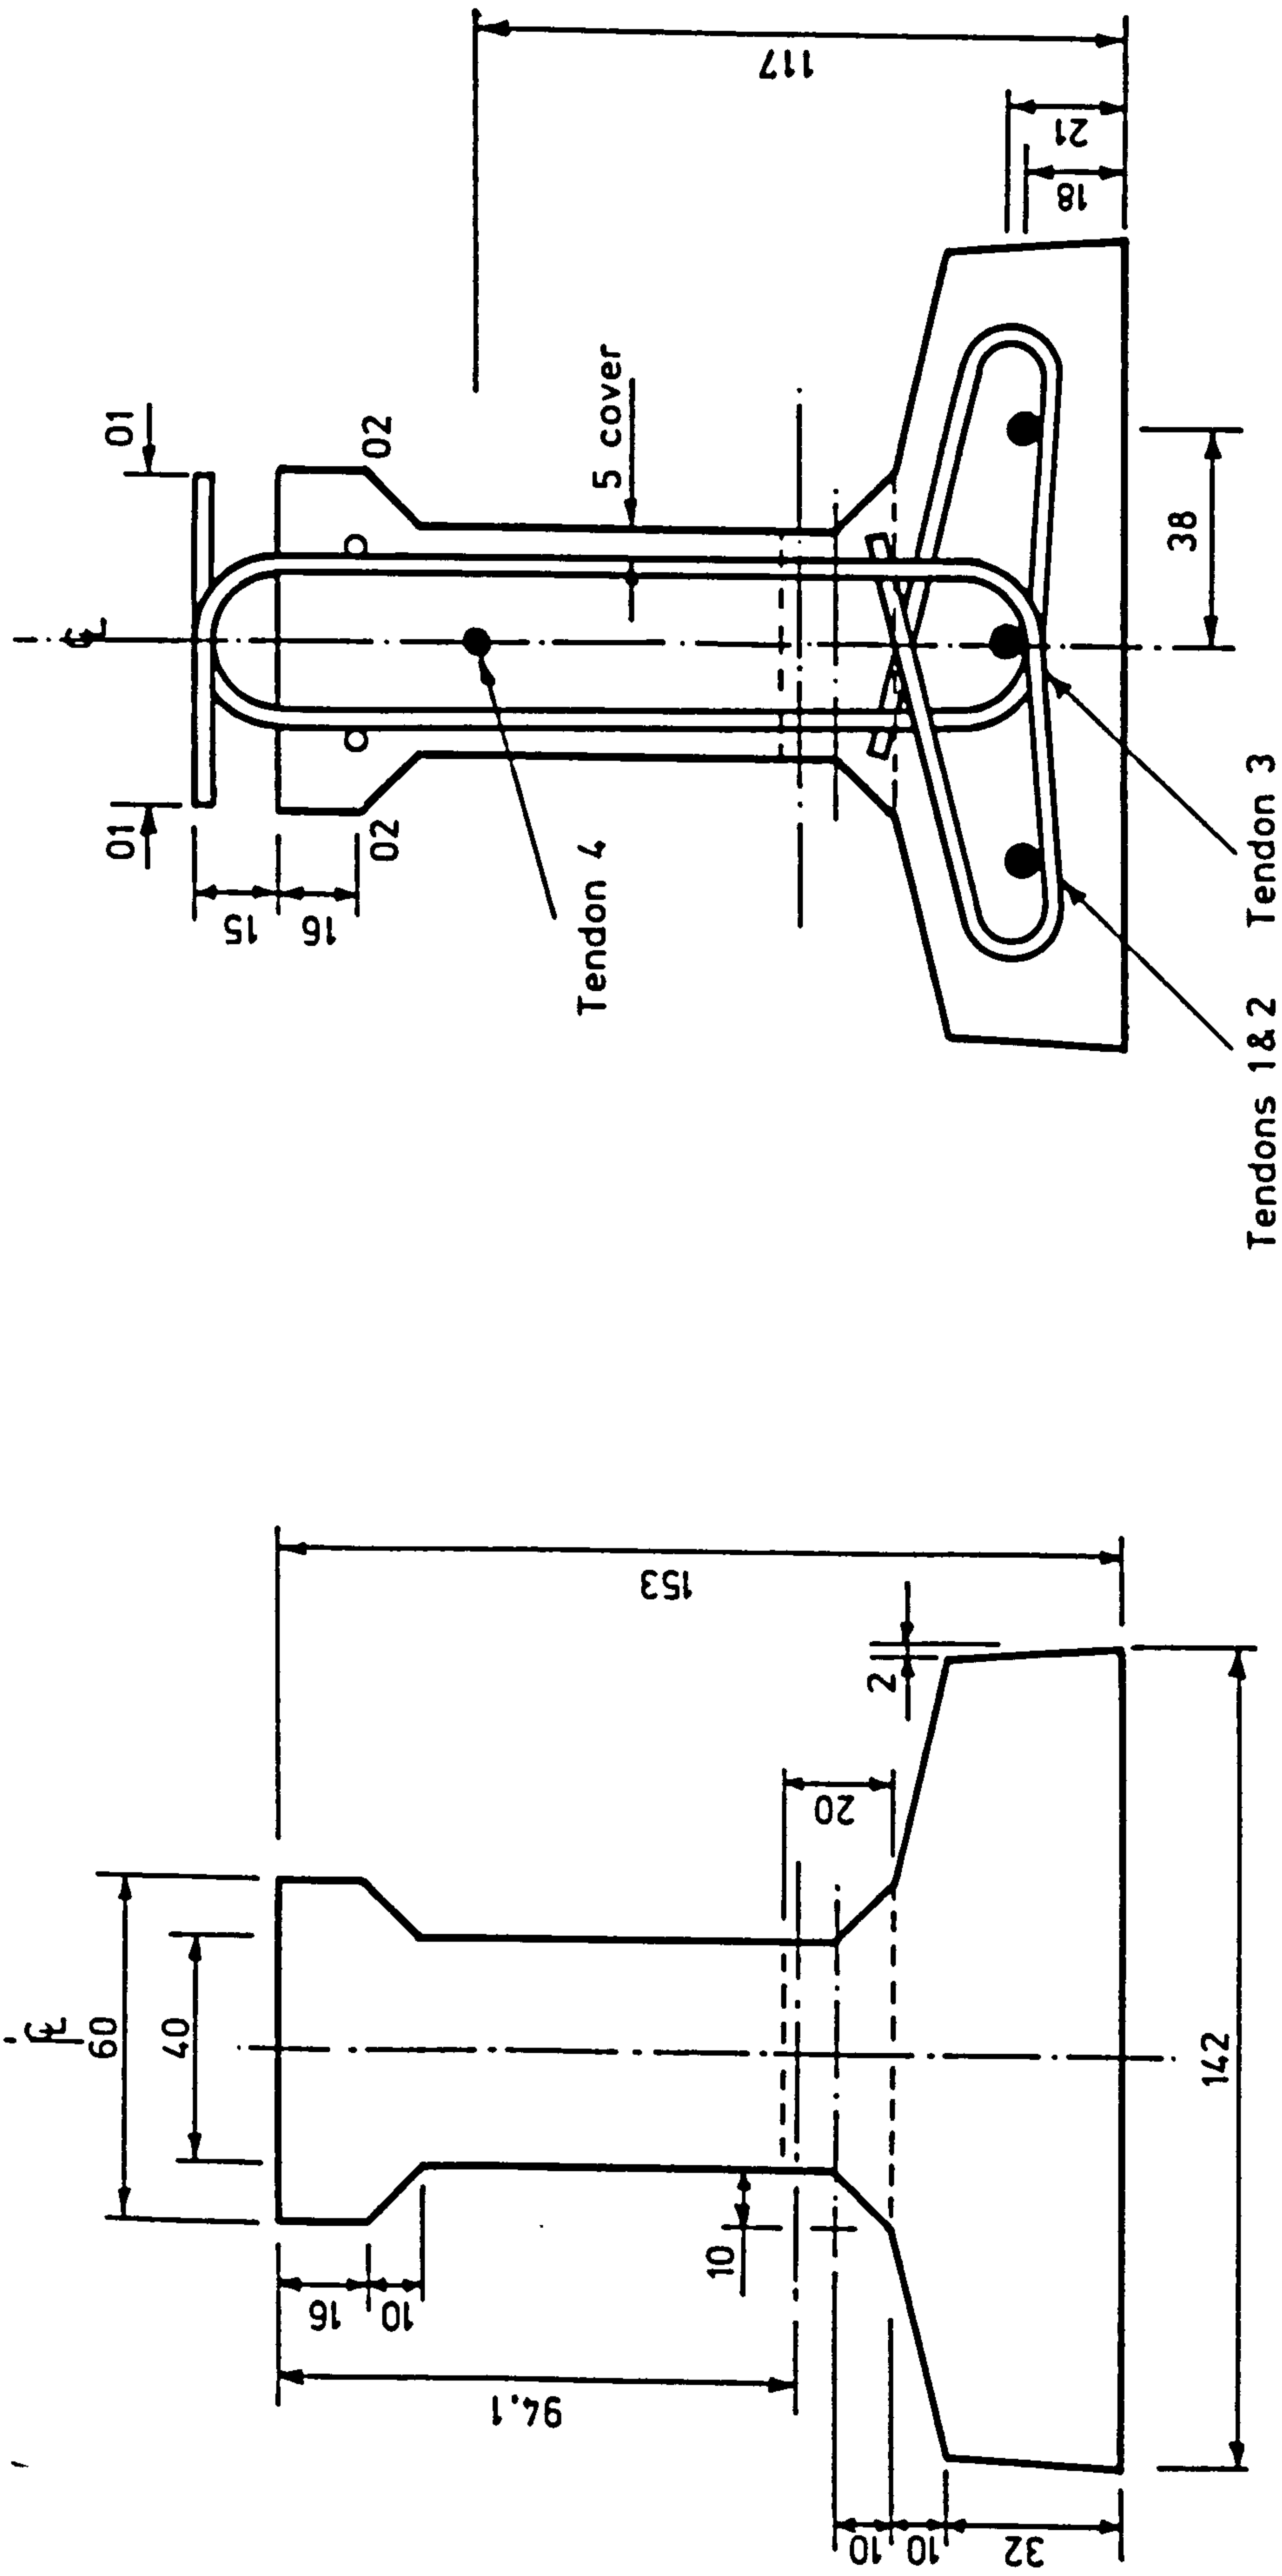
DETAILS OF MODEL BEAM PROFILE AND PRESTRESSING LAYOUT
